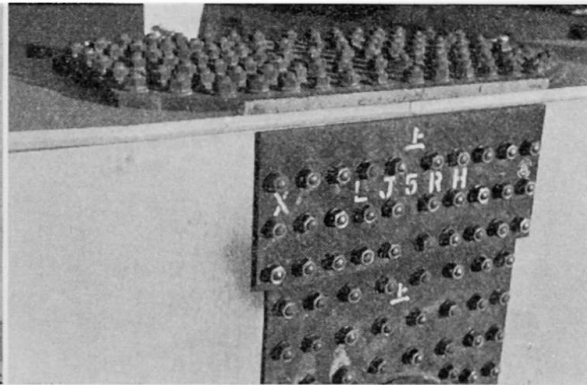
Connection of a stiffening girder of a Lohse girder with box section.
